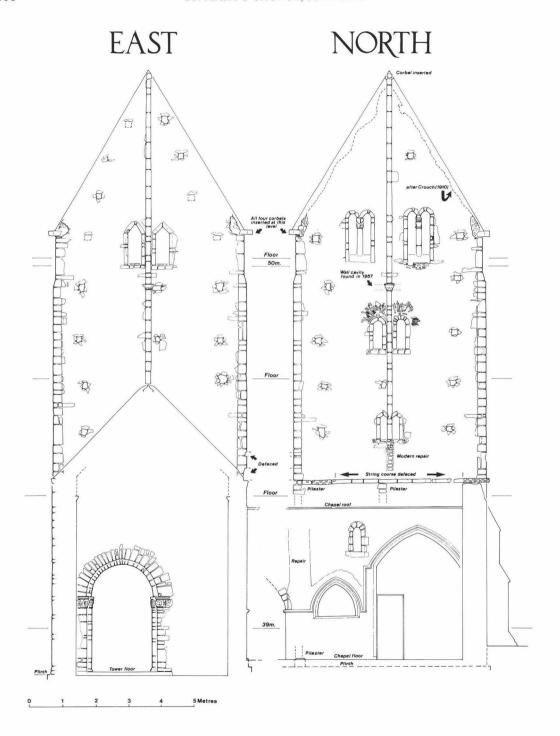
External elevations of the tower (Based on site drawings at 1/20 by F. G. Aldsworth July 1984).
